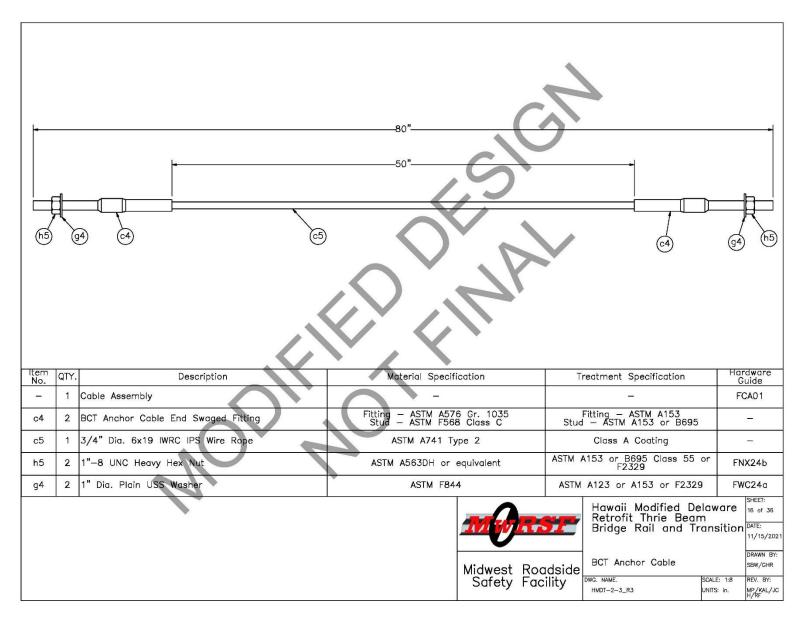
BCT Anchor Cable, Test Nos. HMDT-2 and HMDT-3
